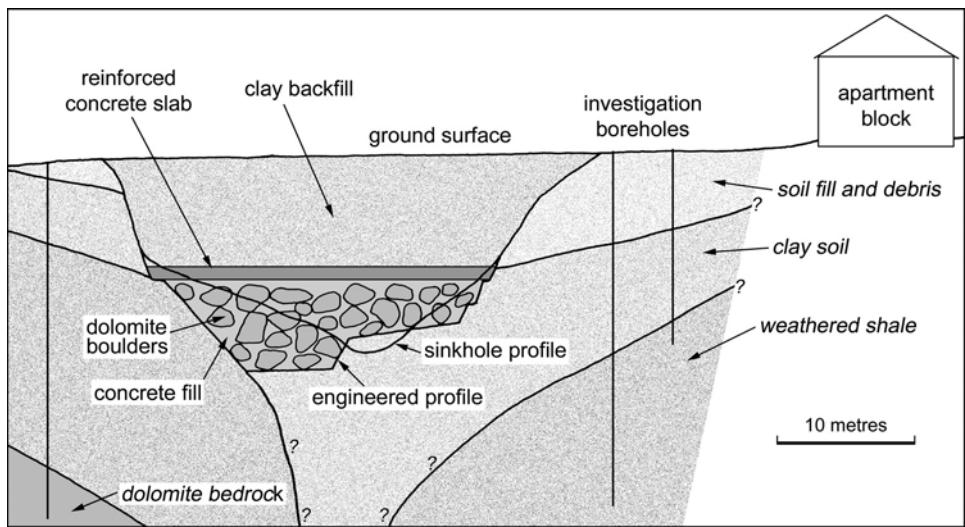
Cross section through the Macungie sinkhole with its engineered remediation and backfill.
